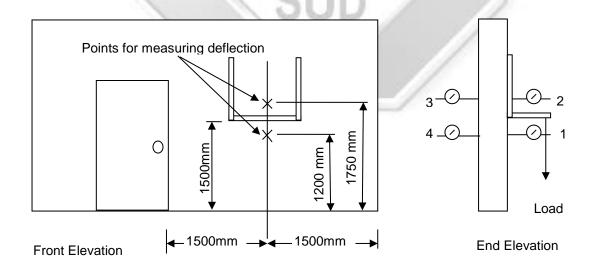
Locations of applied load for heavyweight anchorage (High level wall cupboard) eccentric downward loading test
